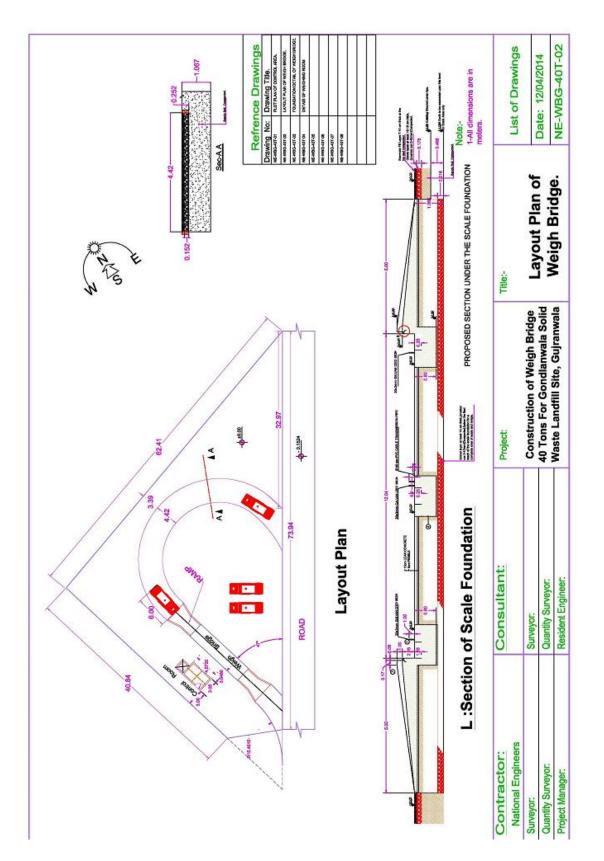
General Plan of Procured Weighbridge at Gondlanwala Solid Waste Landfill Site, Gujranwala
